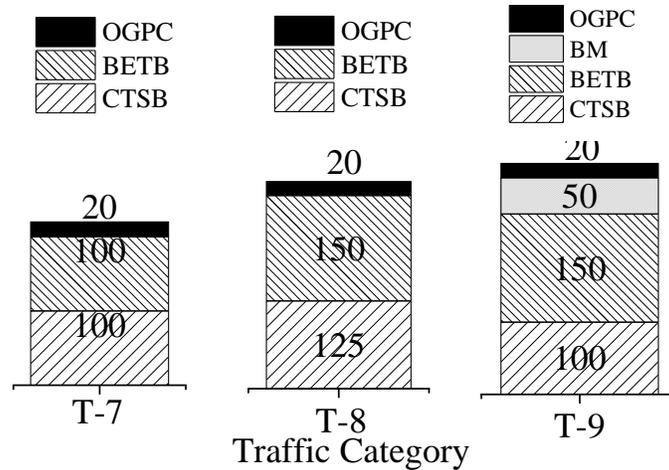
Pavement Composition for Bitumen-Emulsion Stabilized Pavements
